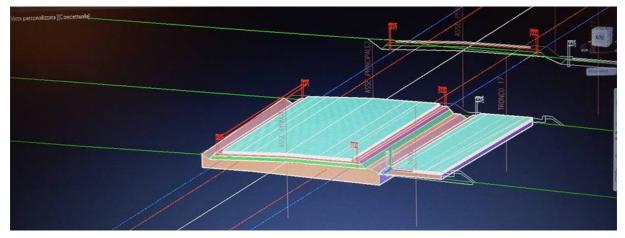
3D Modelling of a road trunk between two road cross sections with each road component separated and loaded on a different layer
